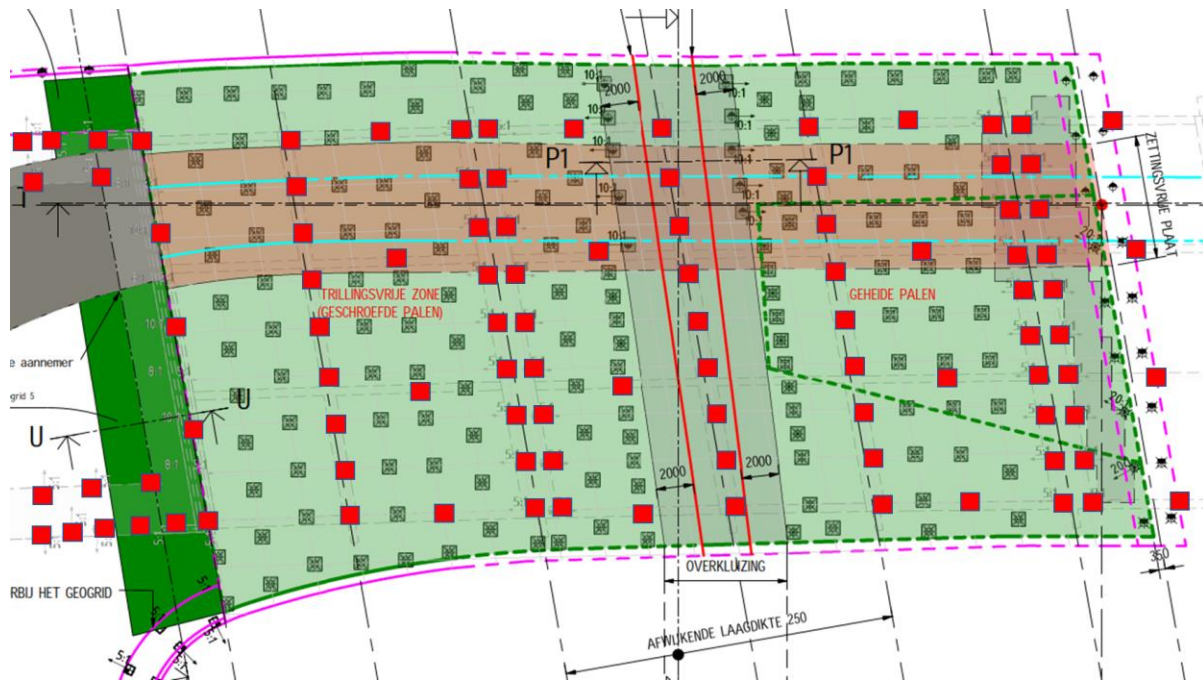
Piling plan of the access ramp on the north bank with new piles (green) and old piles (red)
